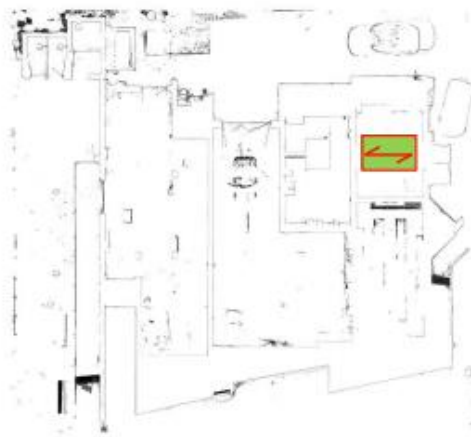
Slab direction First structural floor (ORD\_S\_01)
